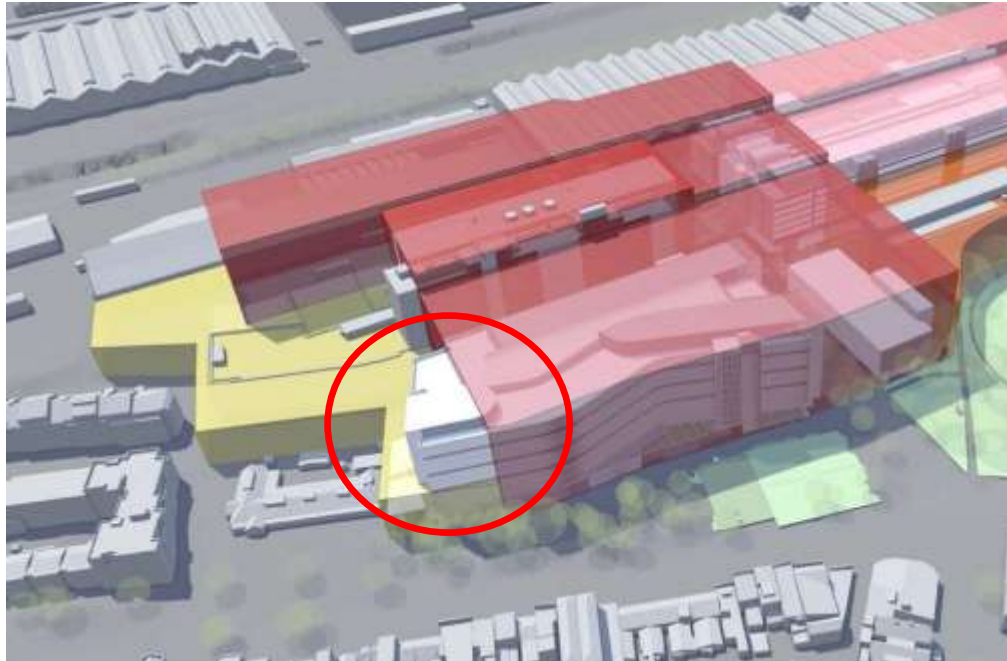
Extent of Building 1 height non-compliance shown in unshaded building envelope relative to maximum height limit and adjoining child care centre
